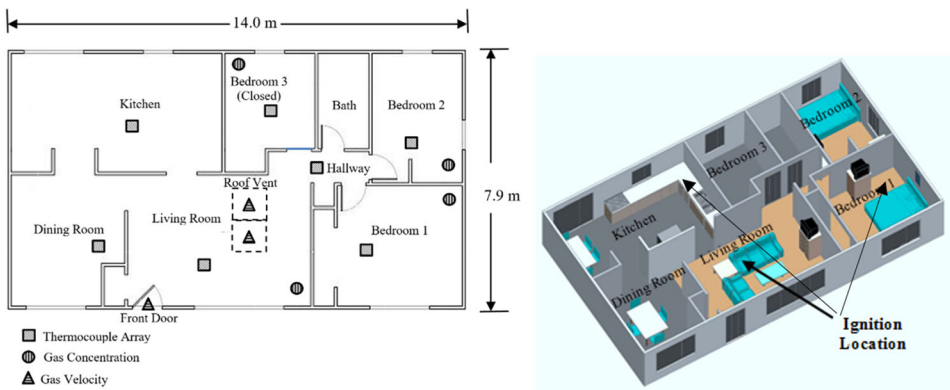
One-story house floor plan and 3D rendering showing furniture and ignition location.
